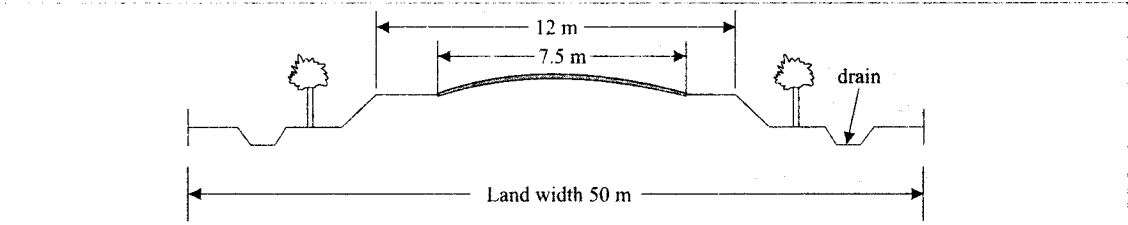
Cross-section of two-lane NH or SH in rural area
